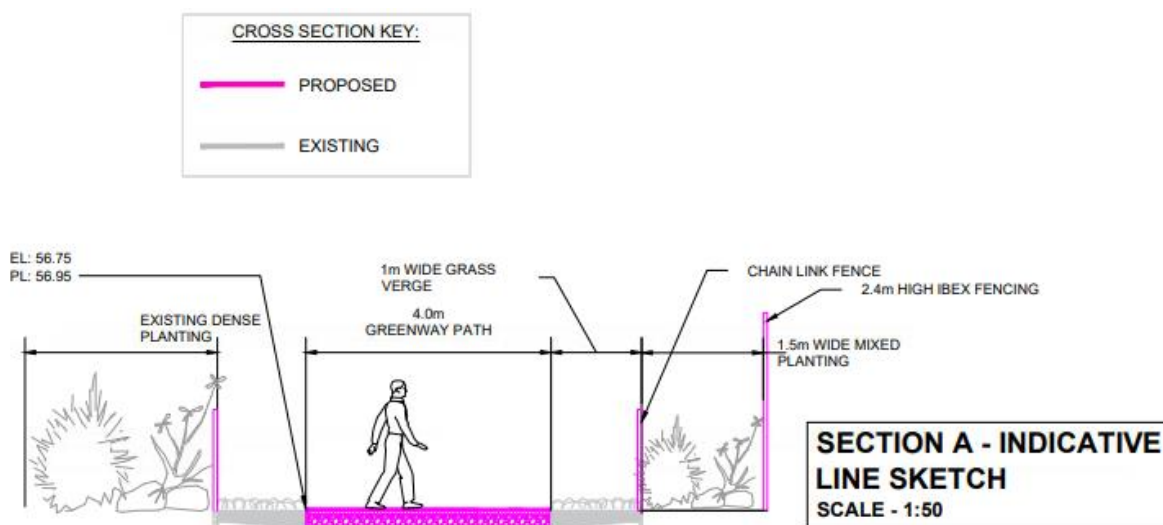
Cross section of the proposed greenway as shown on Drawing 03C
